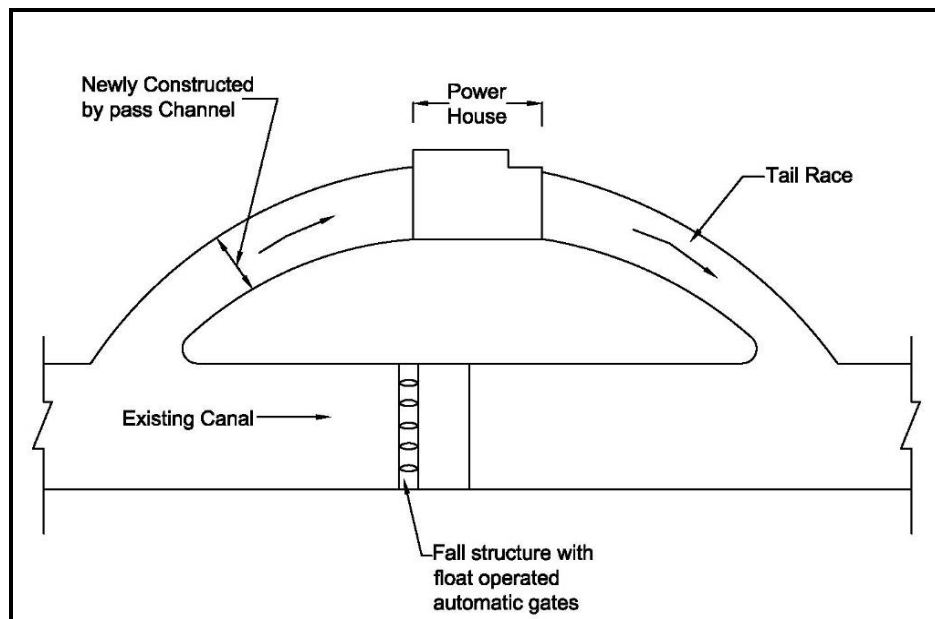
Typical Layout Plan of Power House on Existing Canal
